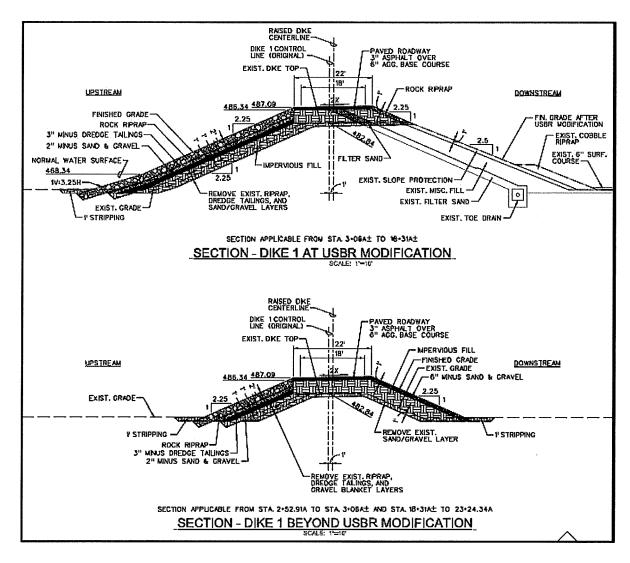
Preliminary typical cross section for 3.5-foot raise at Dike 1.
